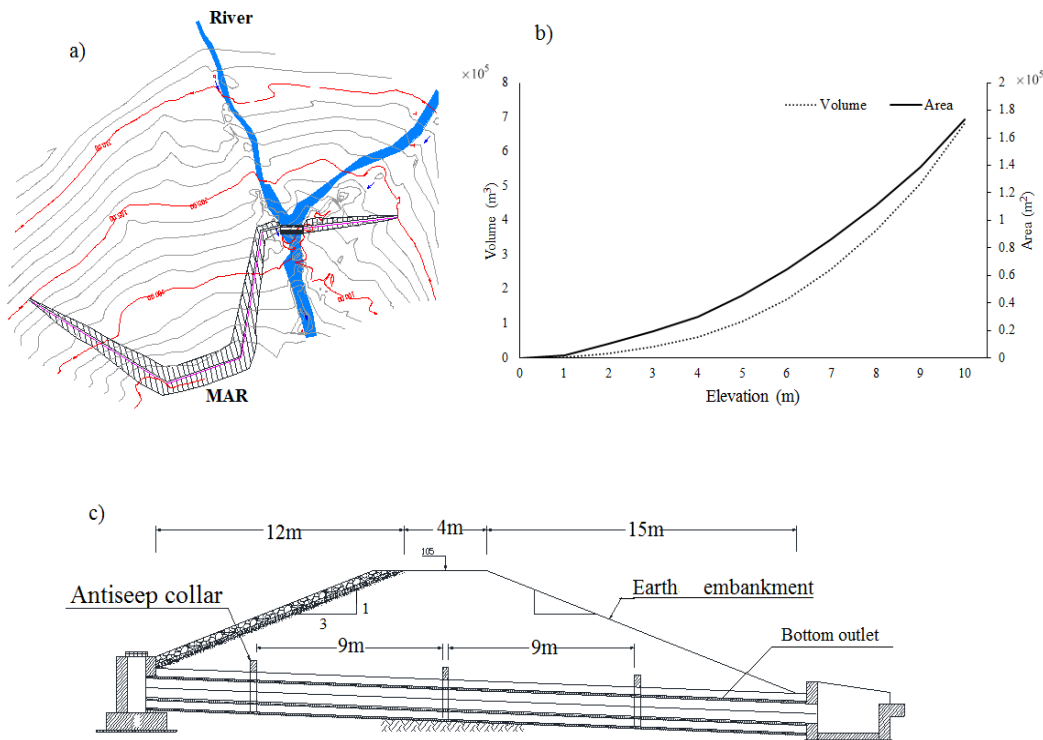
Technical information on Kamal Abad managed aquifer recharge (MAR) facility. a) Layout and topography, b) hypsometric curve of the reservoir (area-volume-elevation) and c) cross-section and bottom outlet.
